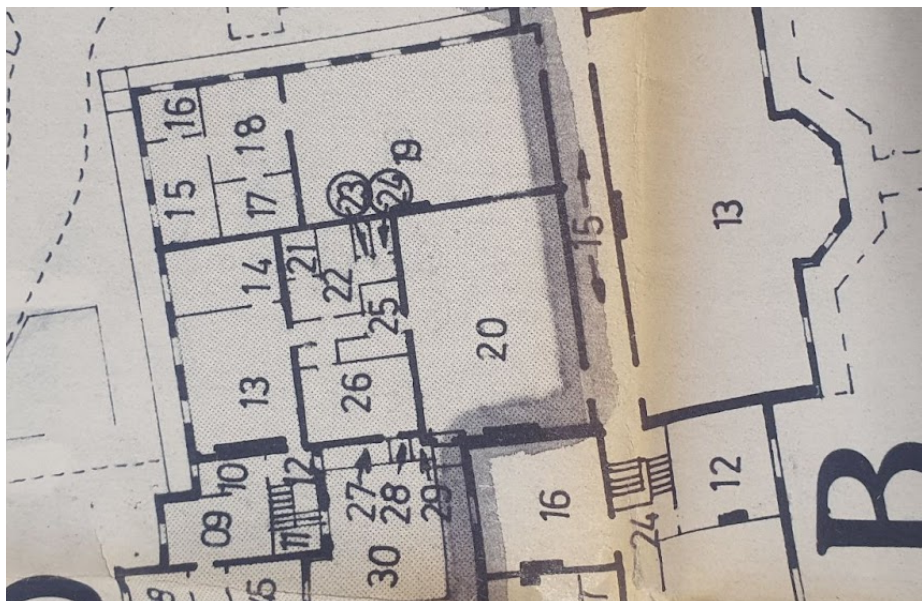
Extract from 1979 first floor plan of the area containing the Waldegrave Suite (source: Richmond Archives)
